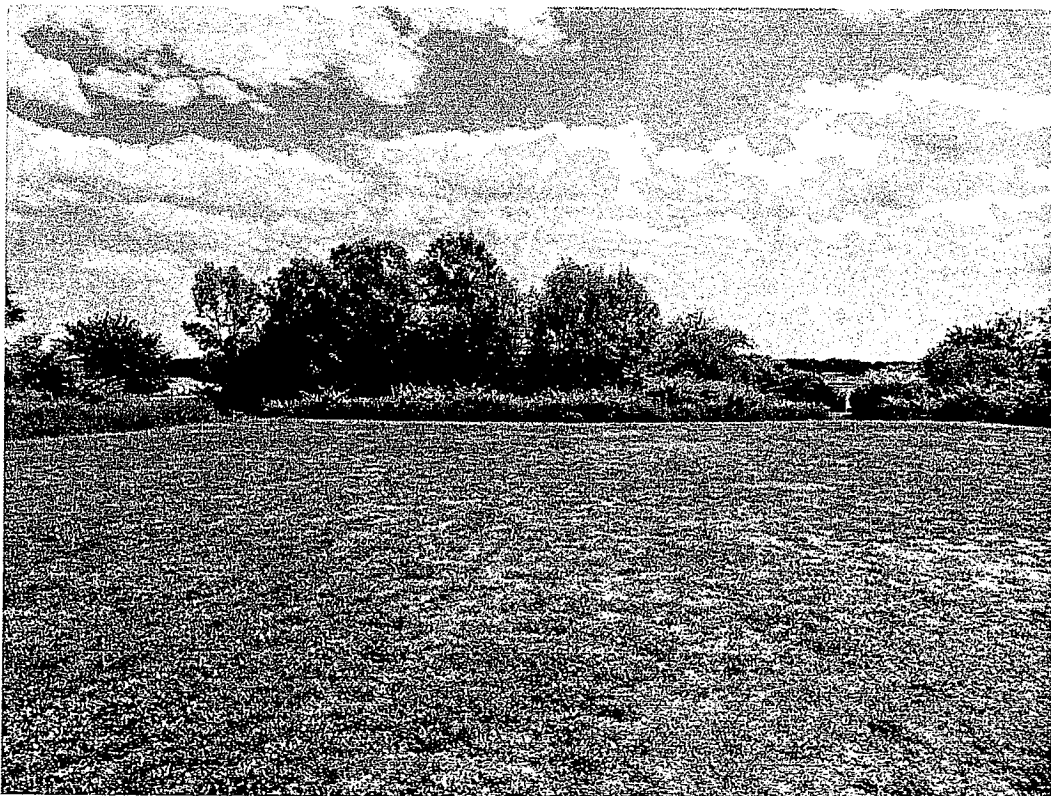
South facing view of the southern portion of the Site (location of TP8).
